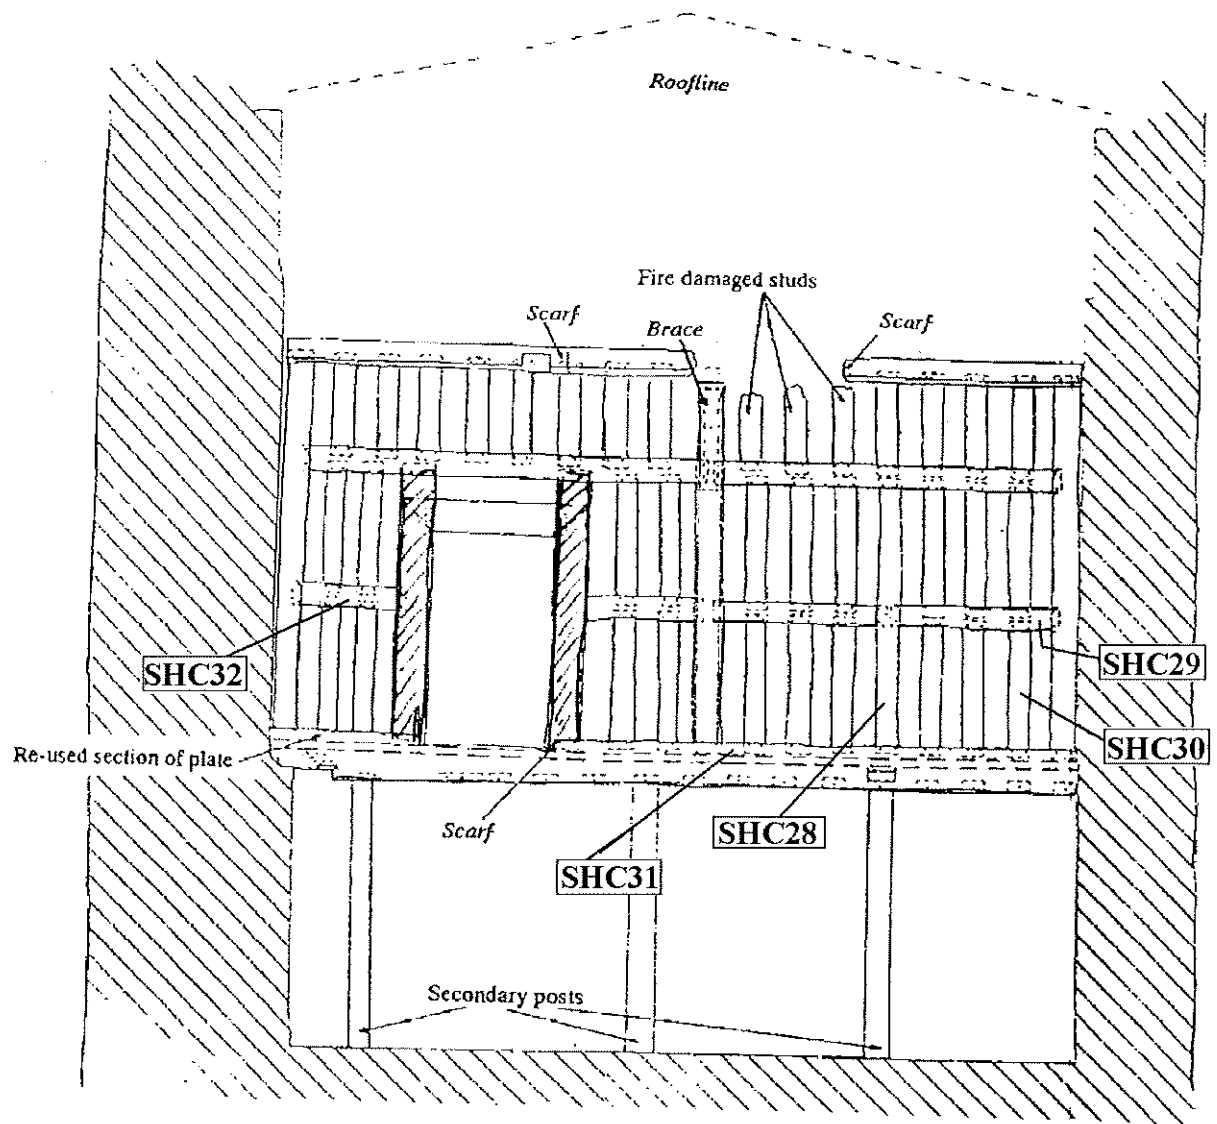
West elevation of the screen in the Hall range, showing the timbers sampled for dendrochronology, adapted from an original drawing in Morriss (2001 unpubl, fig 13)
